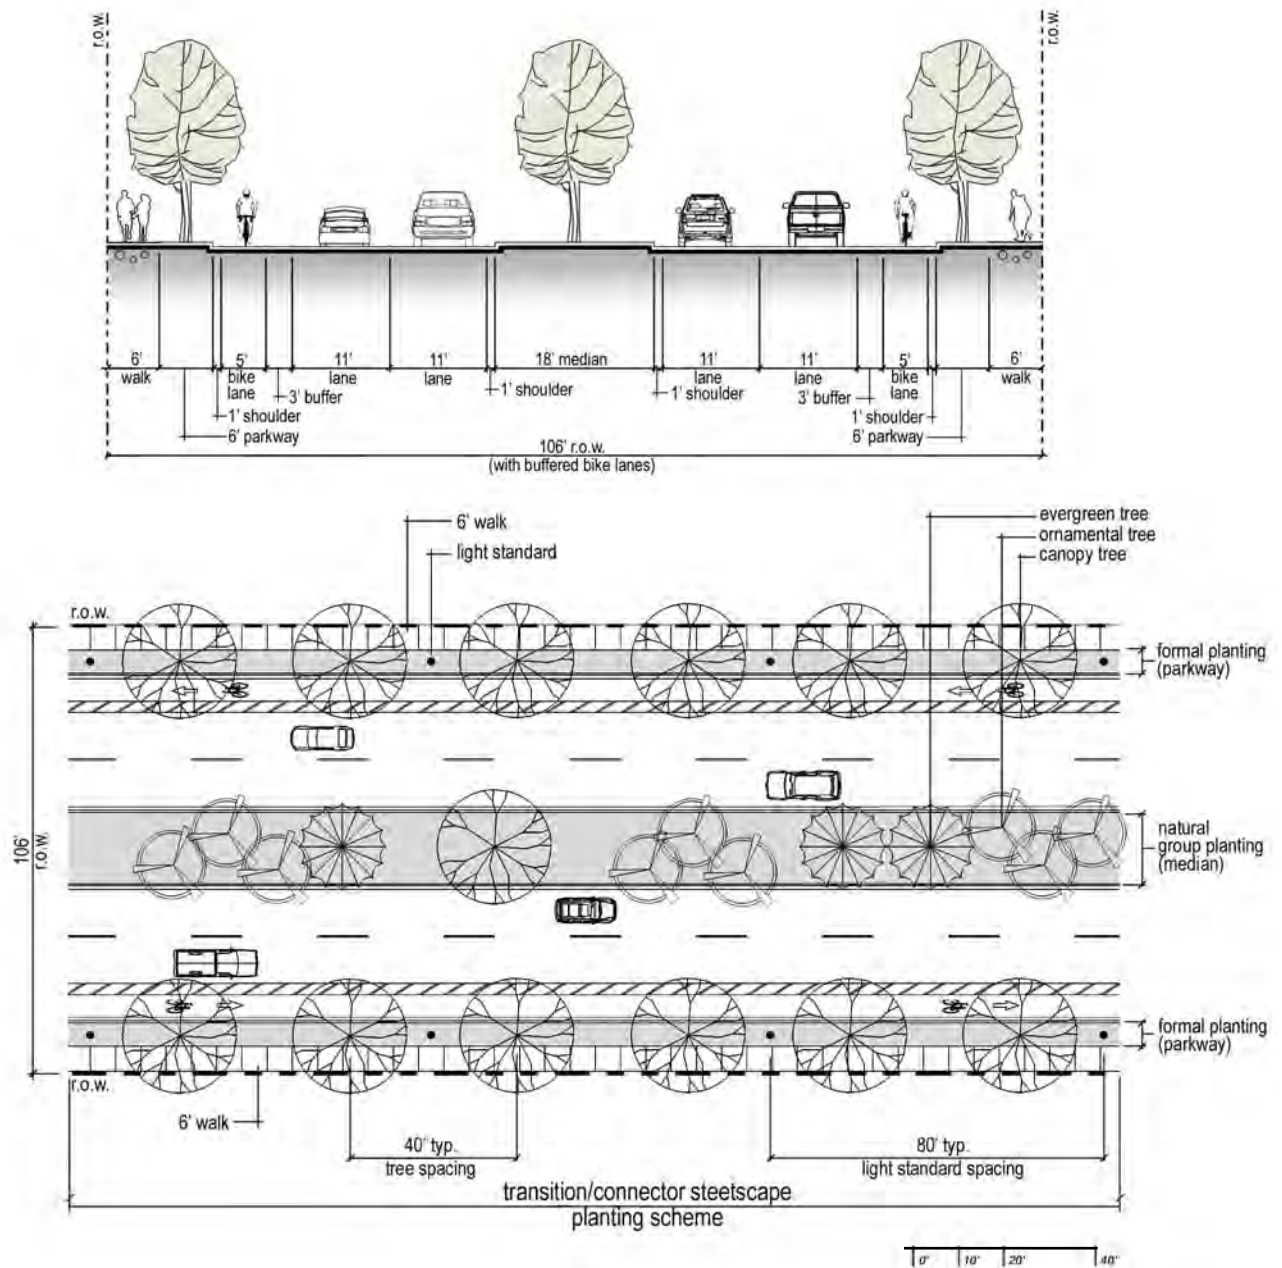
Typical Connector Arterial Section & Plan: Minor Arterial
